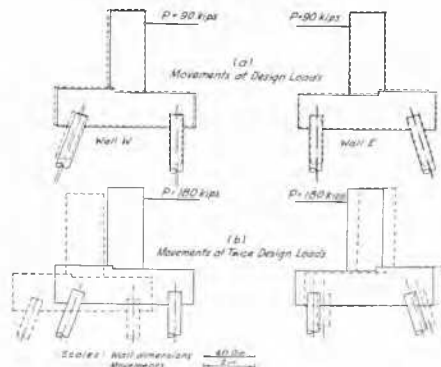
Wall Movements at Design Load and Twice Design Load.
